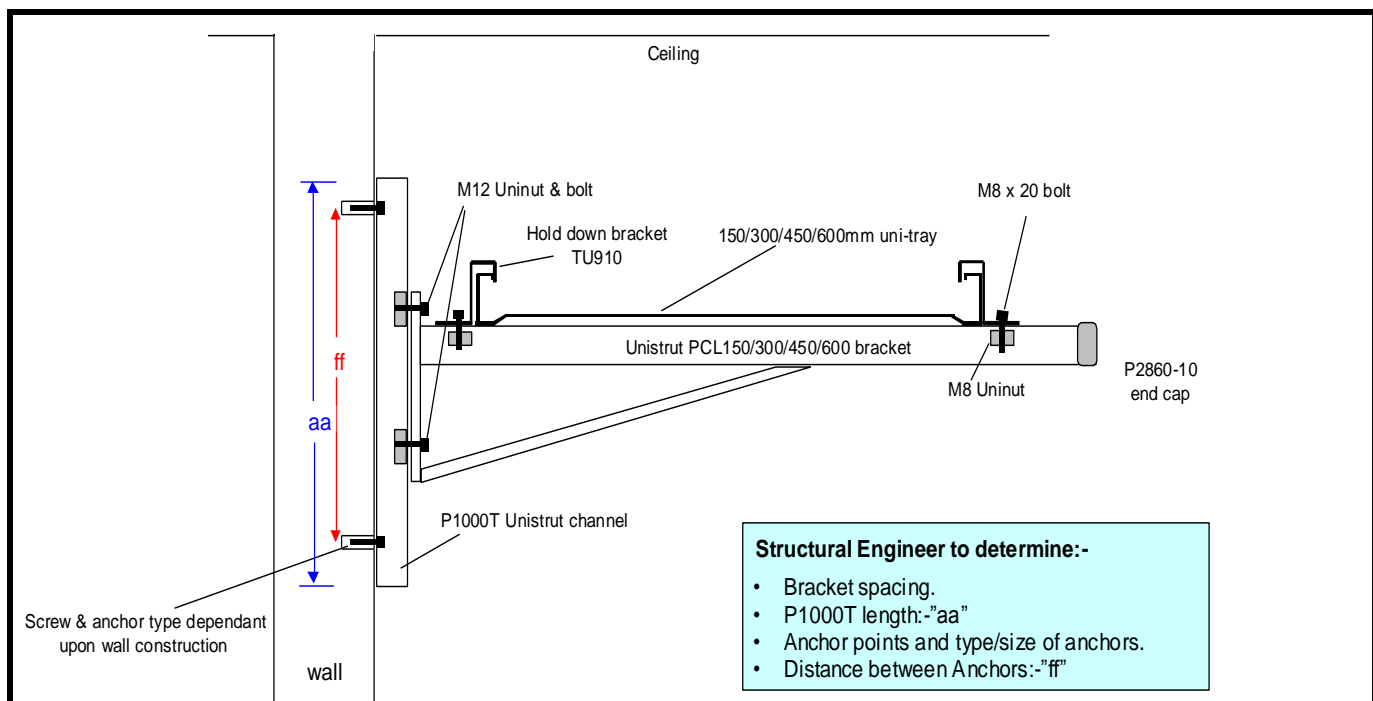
Cantilever Bracket on Solid Concrete Wall
